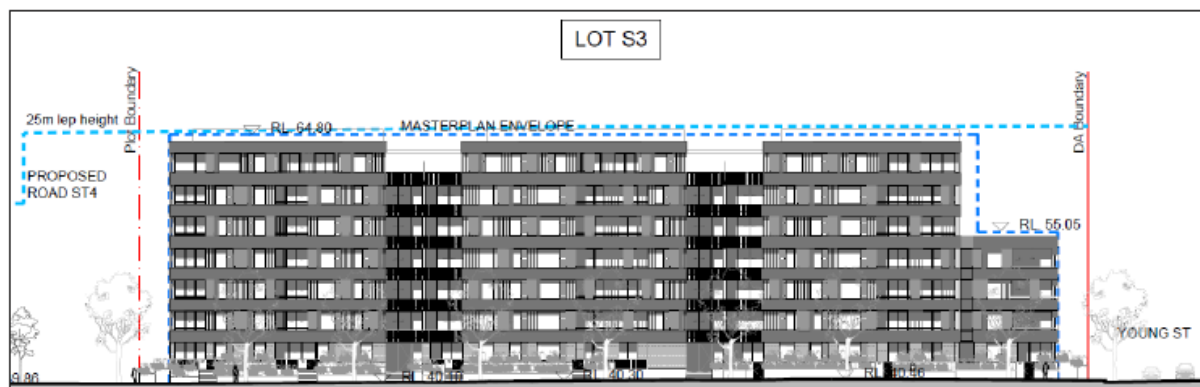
S3.2 Proposed DV1 Streetscape Elevation
